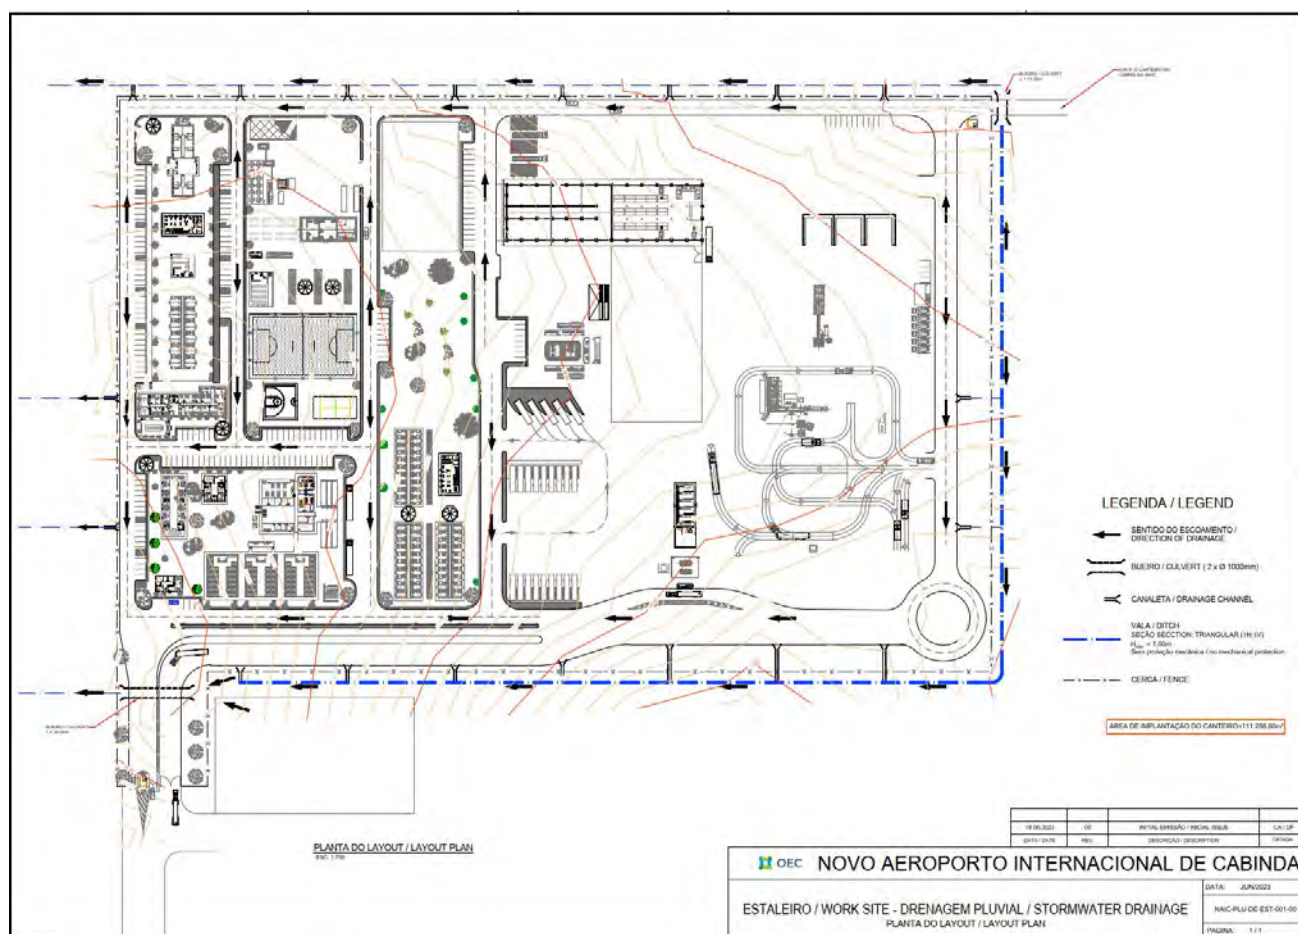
Stormwater Drainage System - OEC Construction Camp.
